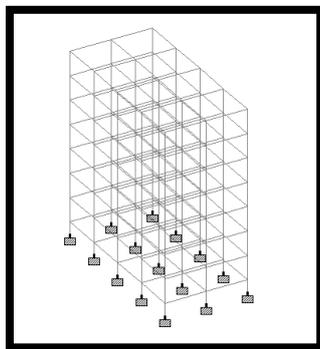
3d rendered view of rectangular shaped building (Model 1)
